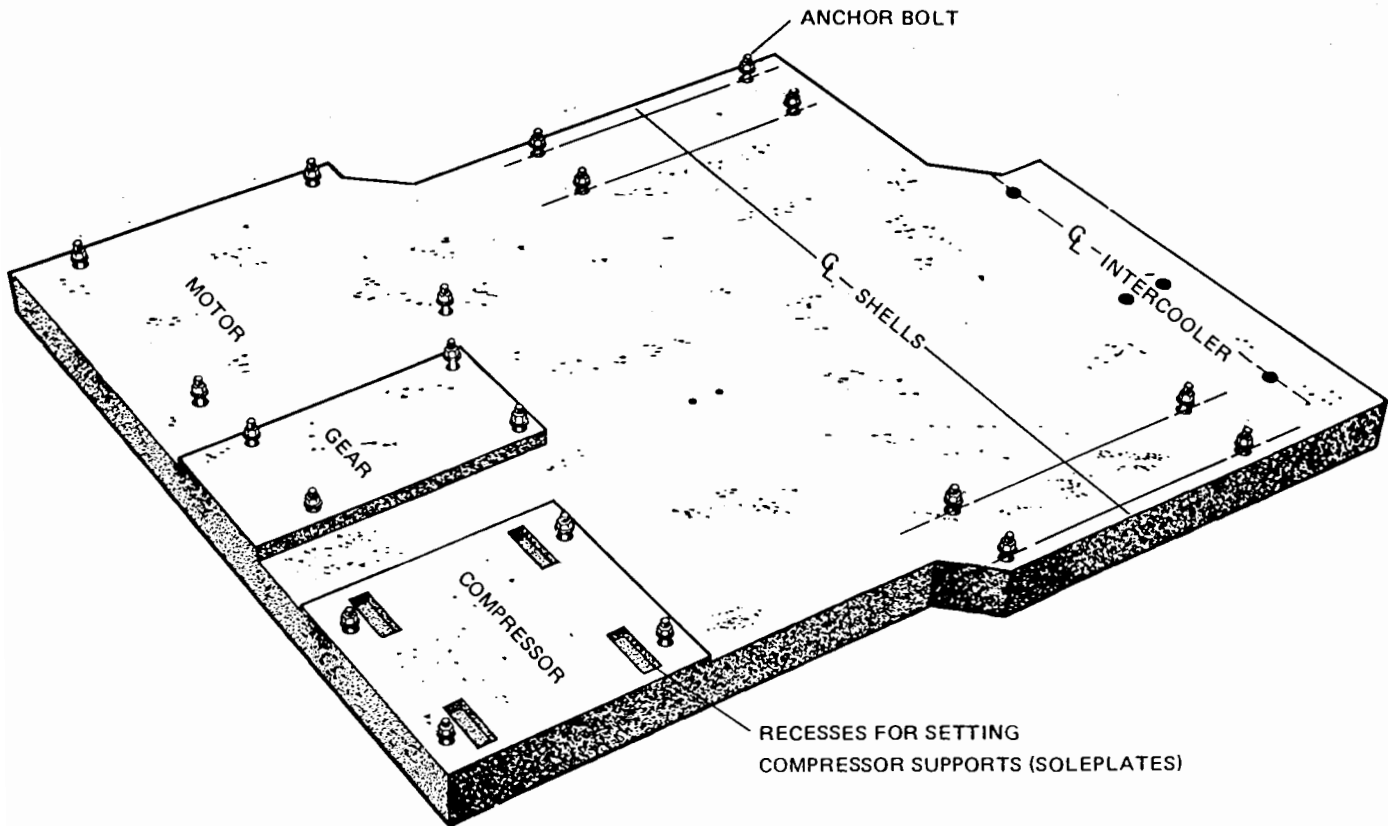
TYPICAL REINFORCED CONCRETE BASE – ROUGH LEVEL
